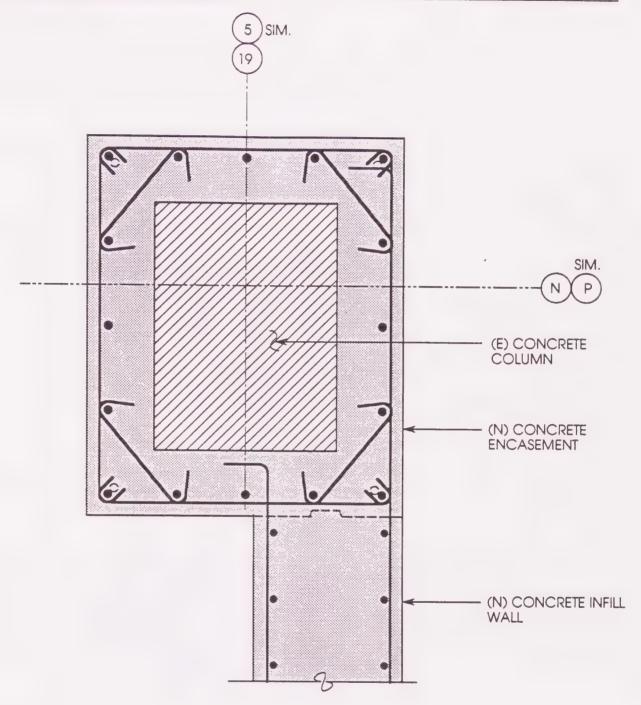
Retrofit Scheme - Corner Column & Infill Wall Below 3rd Flr.
